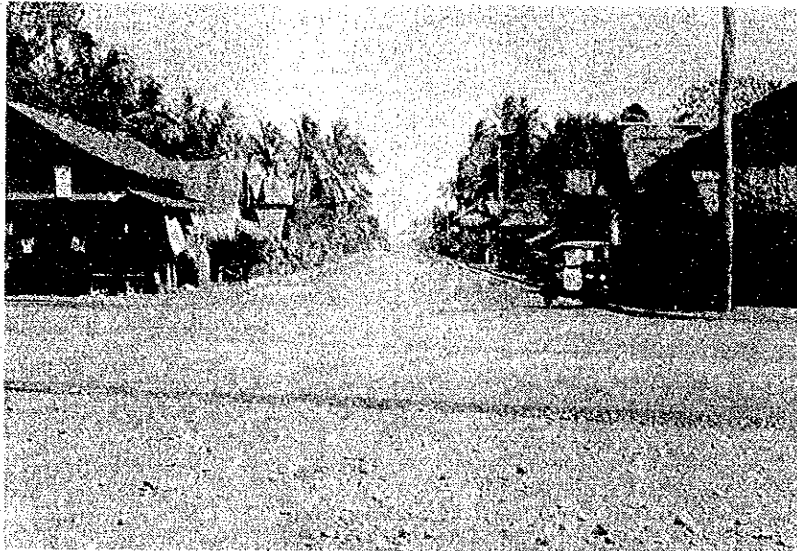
Tangub city, Labuyo (Asphalt, Fair)
